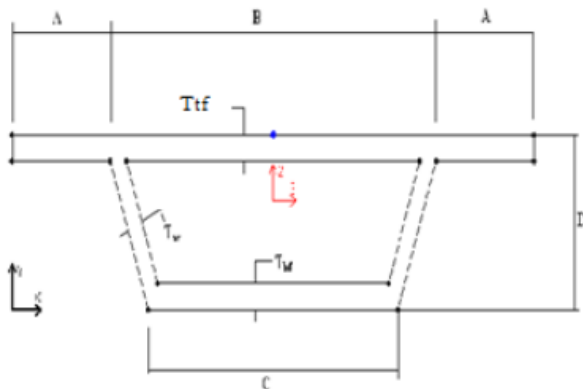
Single-cell Trapezoidal cross-section of Box Girder Bridge
